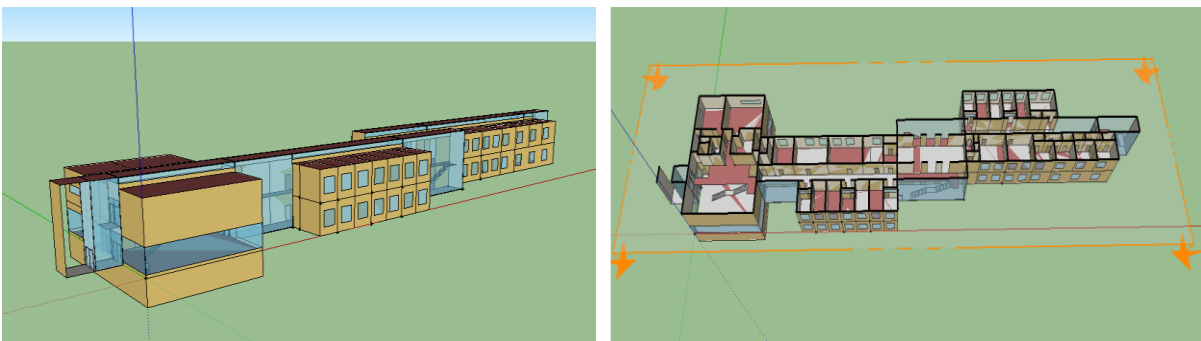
Maersk building 3D Sketchup model, (a) southwest view, (b) floor 1 top view
